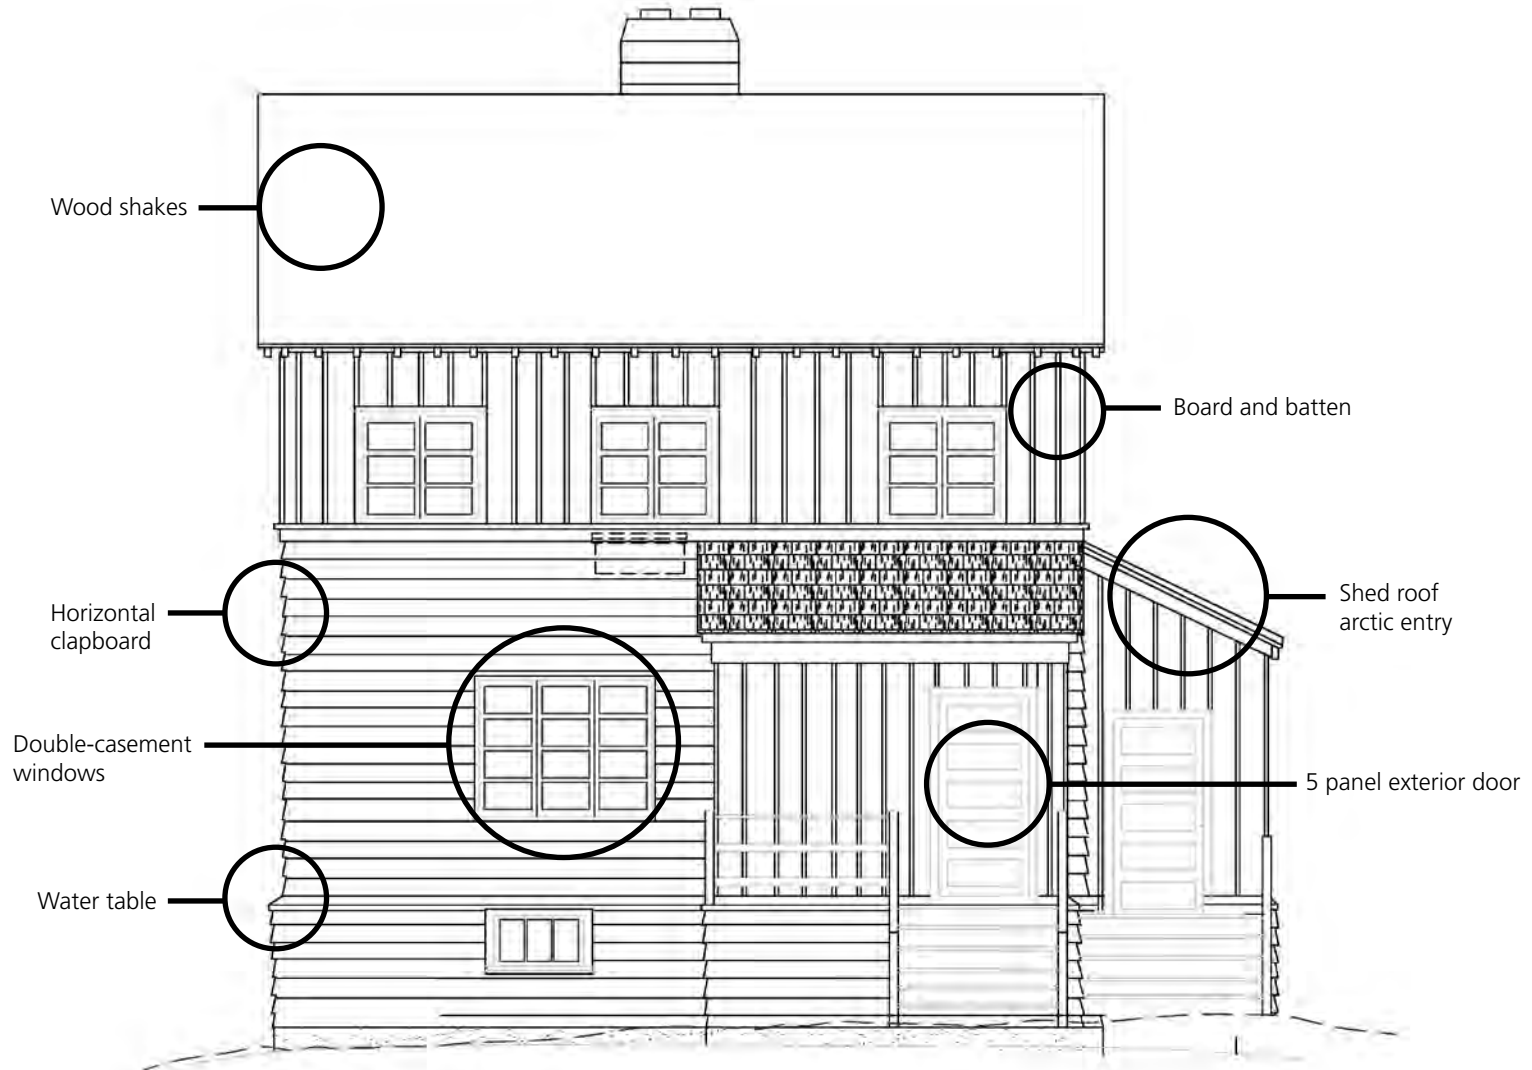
Building 13, East Elevation, 2012 (NPS Alaska Regional Office files)
